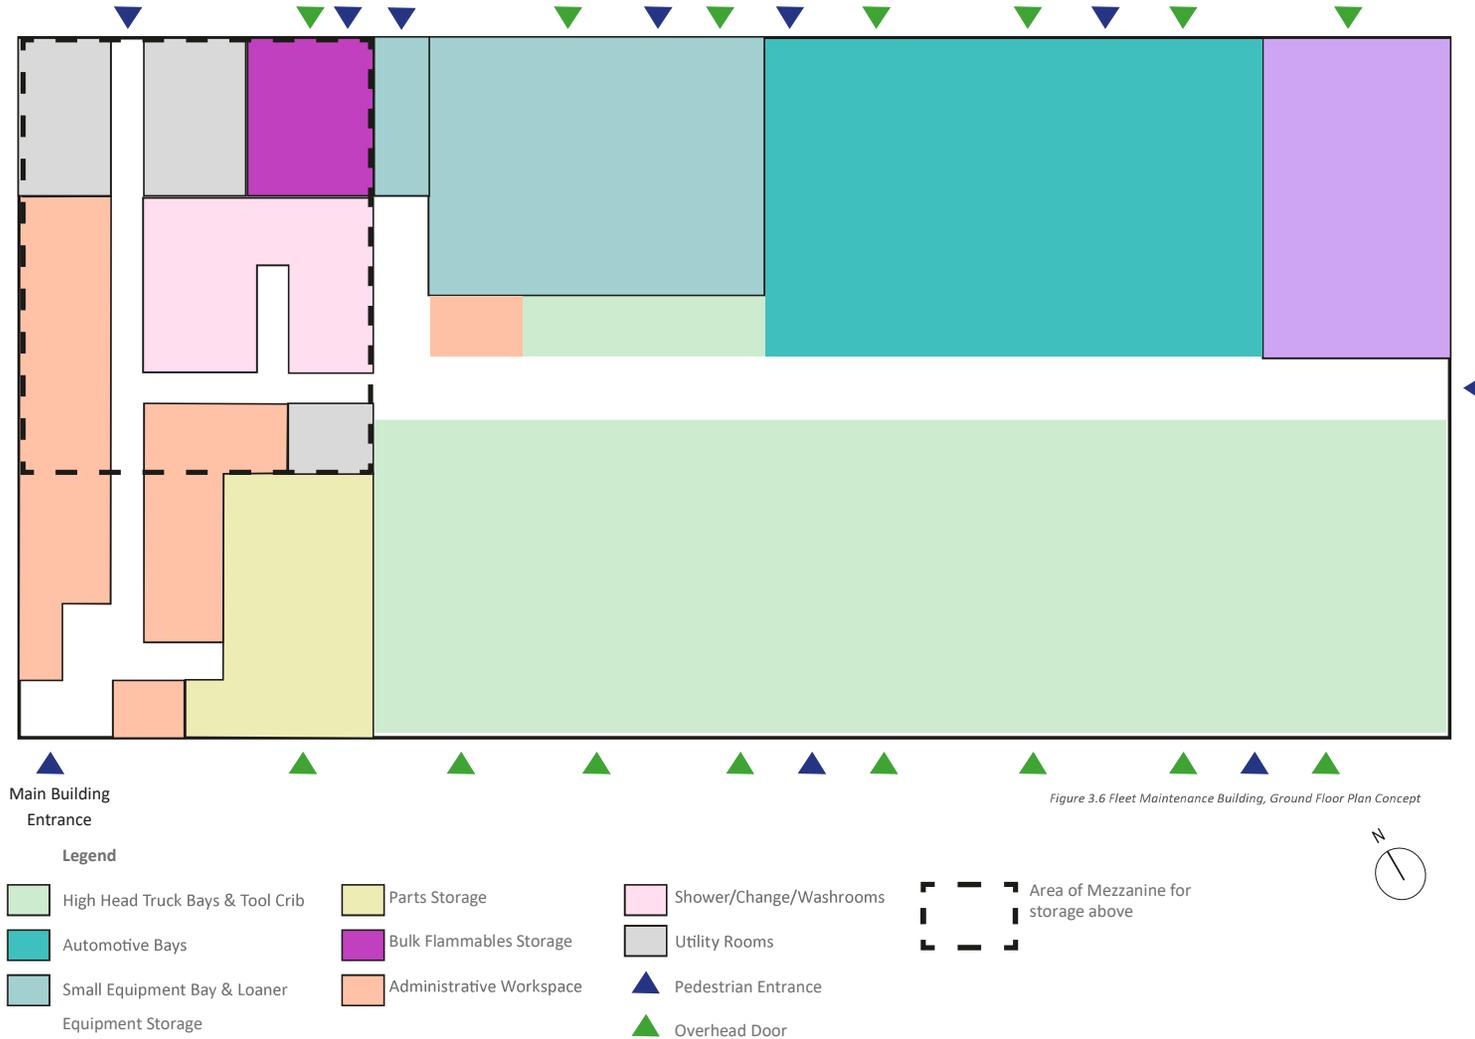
Fleet Maintenance Building, Ground Floor Plan Concept
